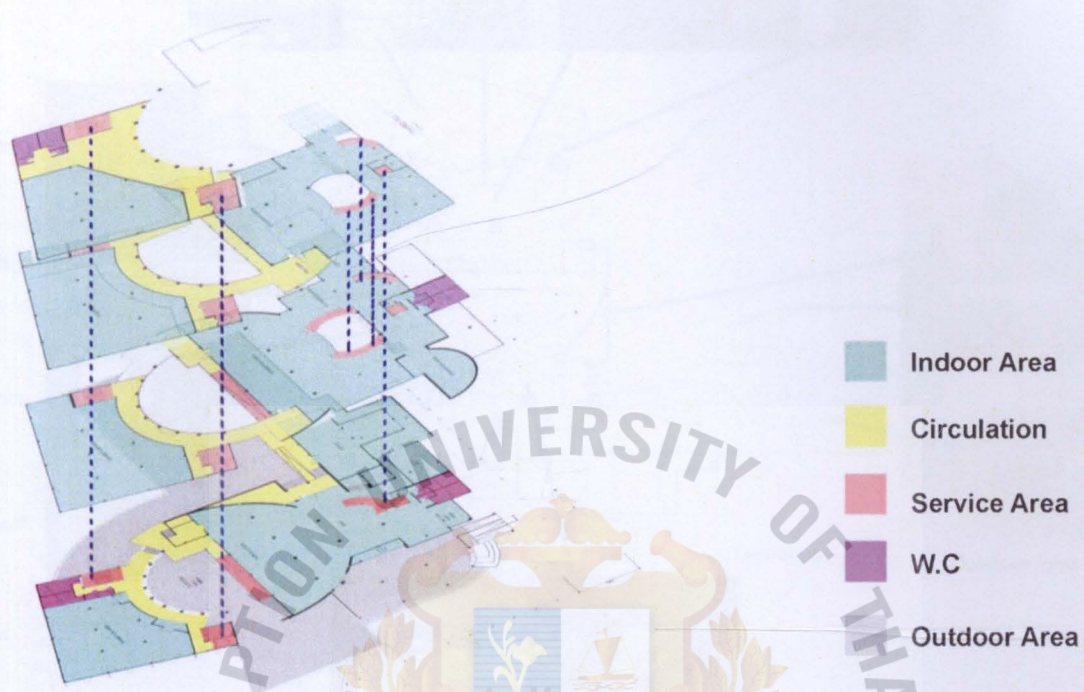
BUILDING ACCESSIBILITY
